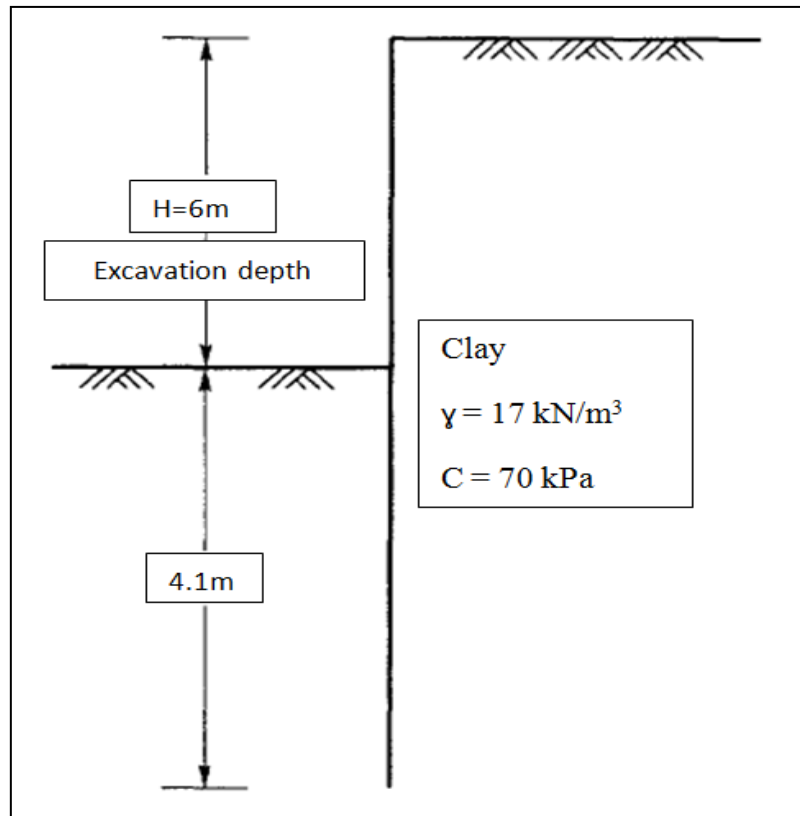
Sheet pile wall in cohesive soil (Moorthy)
